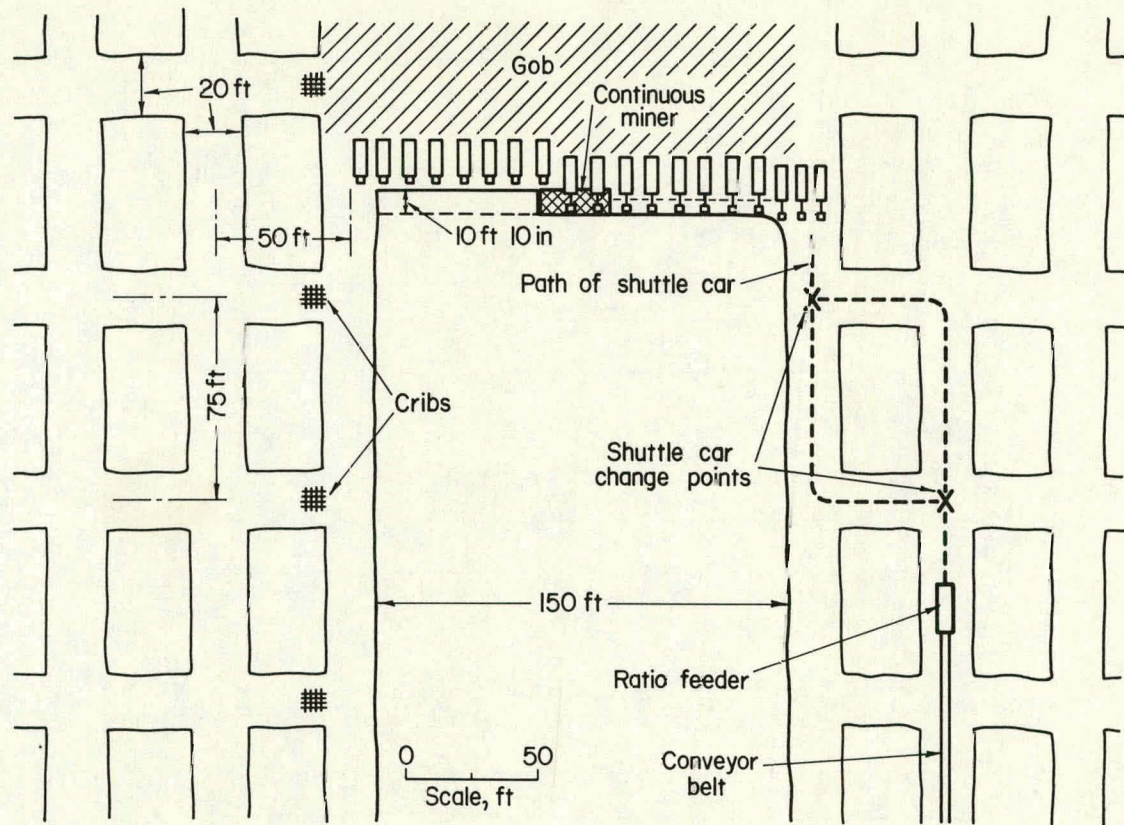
Shortwall Arrangement, 2 West Section, D Unit.
